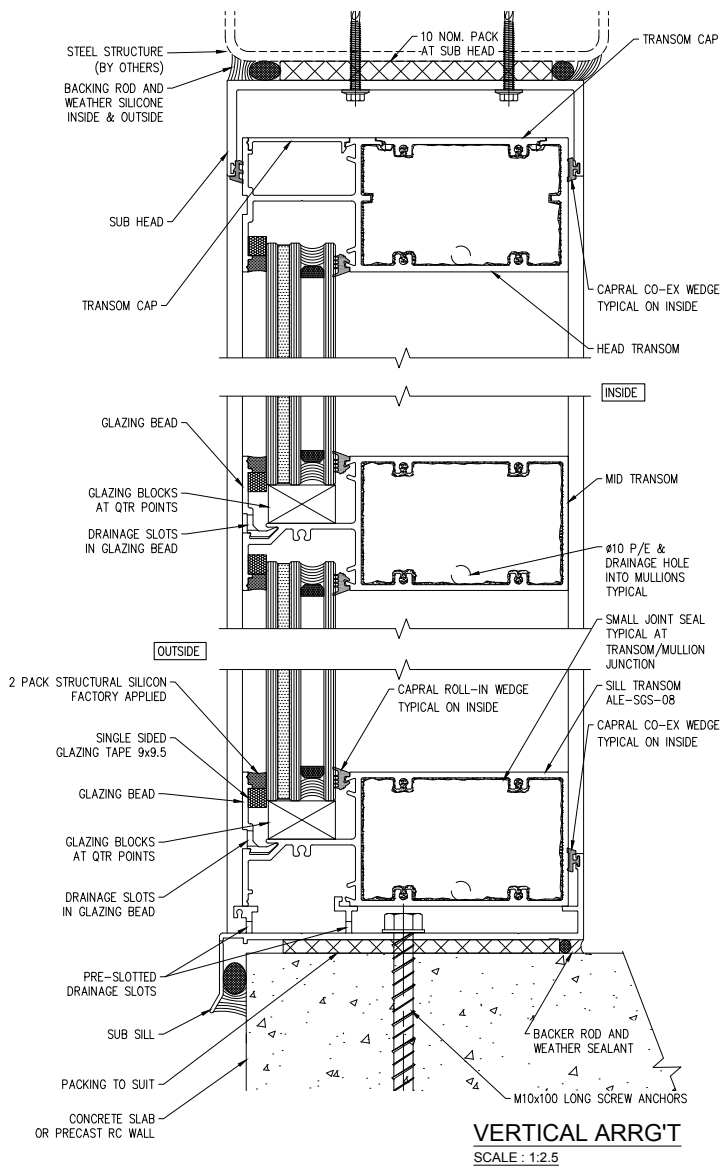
IMOC – Ground and first floors façade glazing, western elevation. © Pindan/JML-Craft
